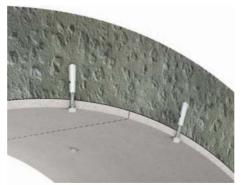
SECTION THROUGH CURVED CONCRETE SECTIONS
